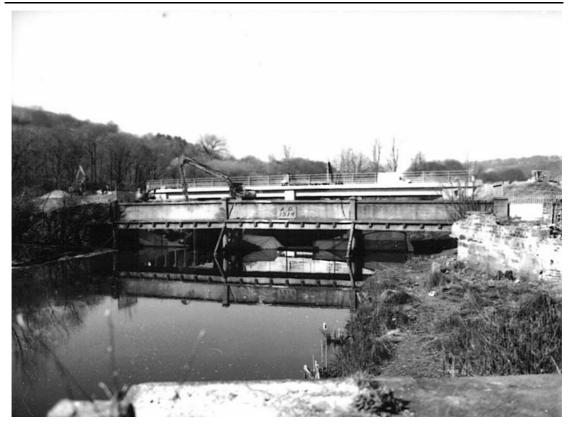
West-facing view across the river Calder showing the south-east-facing elevation of Sterne Bridge (MF SB04_12)
